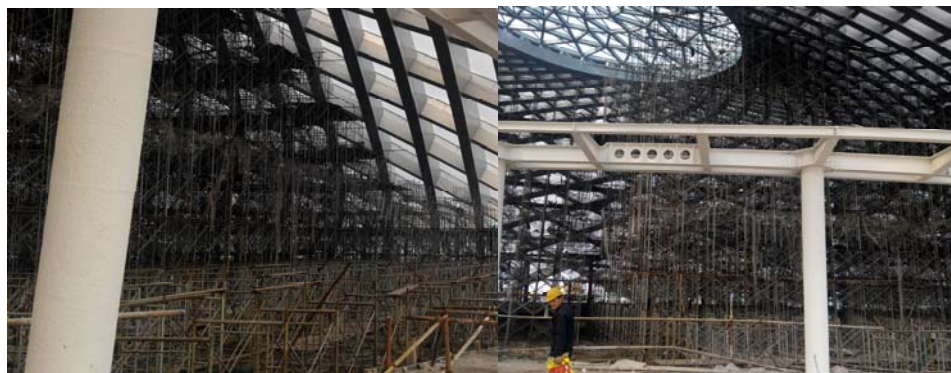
Door-type Modular Steel Ascaffold at YUJIAPU
